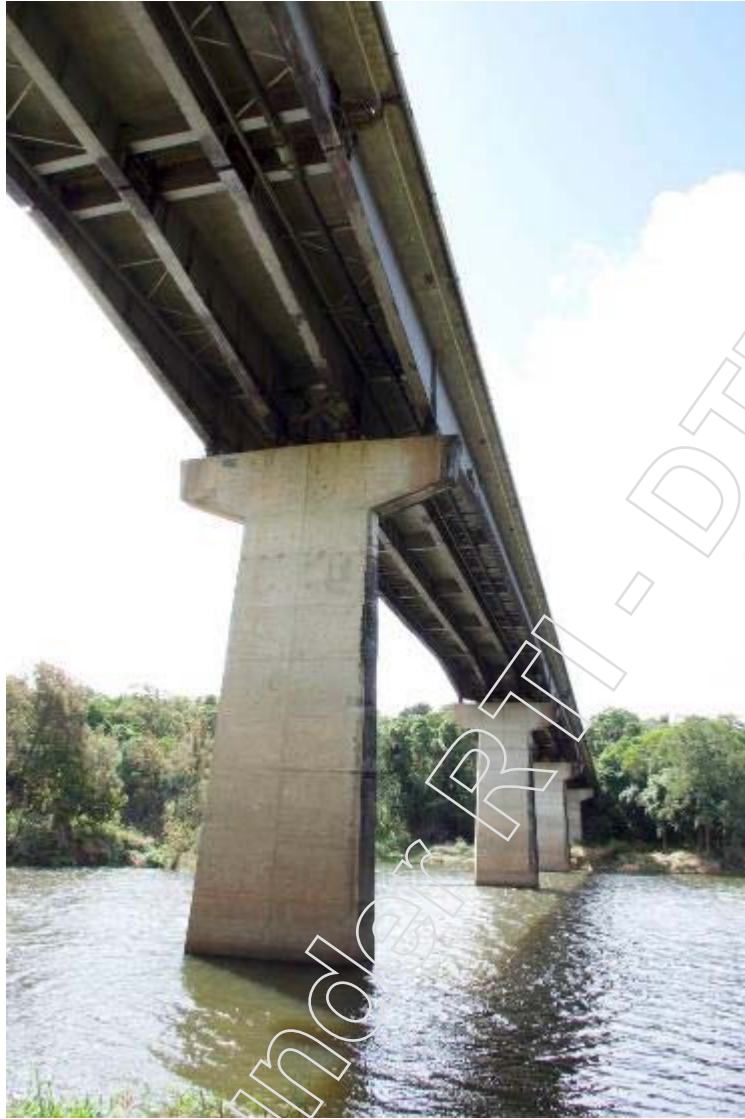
Barron River Bridge. Note: Fabricated steel girders, cross-girders, drop-in span joints, services, rail for inspection gantry, piers (26 May 2018)
